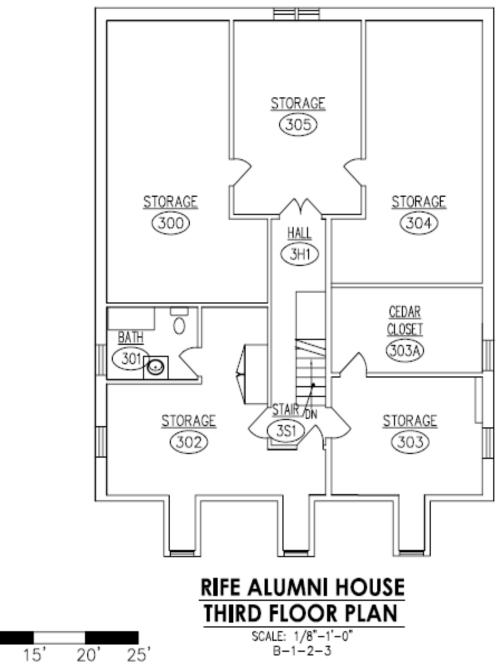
Study Site – Shippensburg University Richard D. Rife Alumni House third floor plan.
